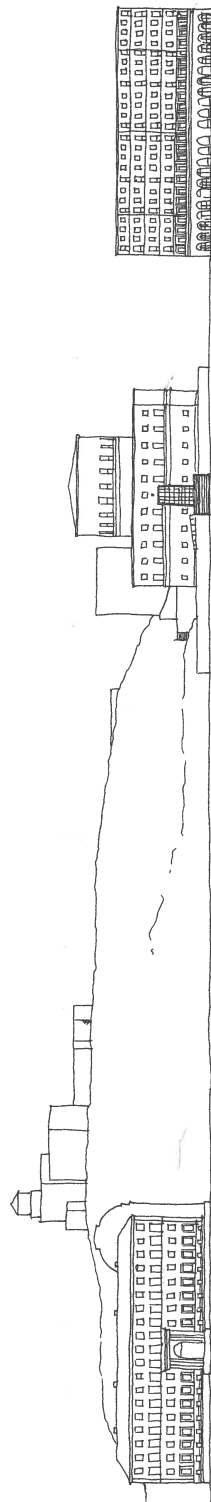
east elevation 1:2000, proposal pre p2 crit
